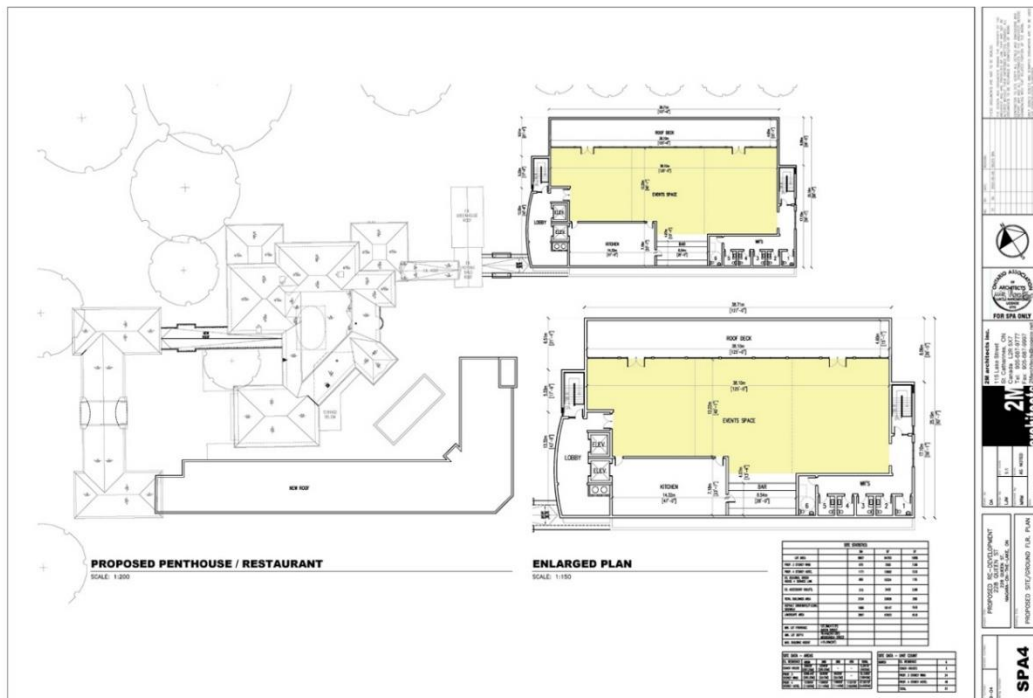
Proposed Penthouse/Restaurant, 2M Architects (APPENDIX II)
